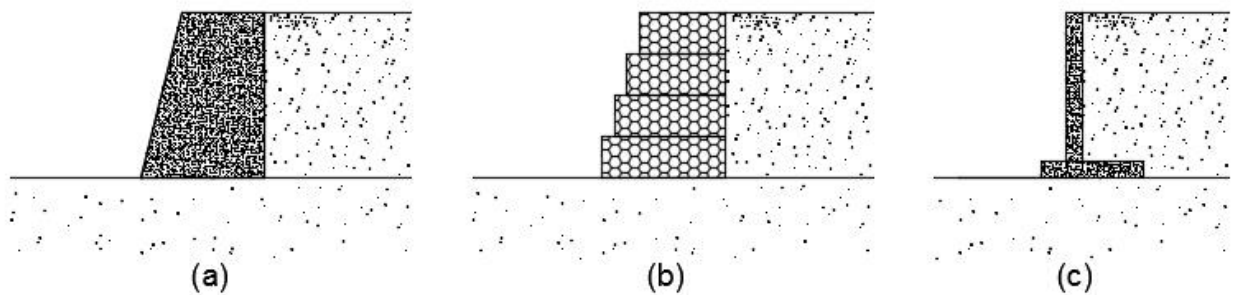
Retaining wall types (a) Gravity wall, (b) Gabion wall and (c) Cantilever wall
